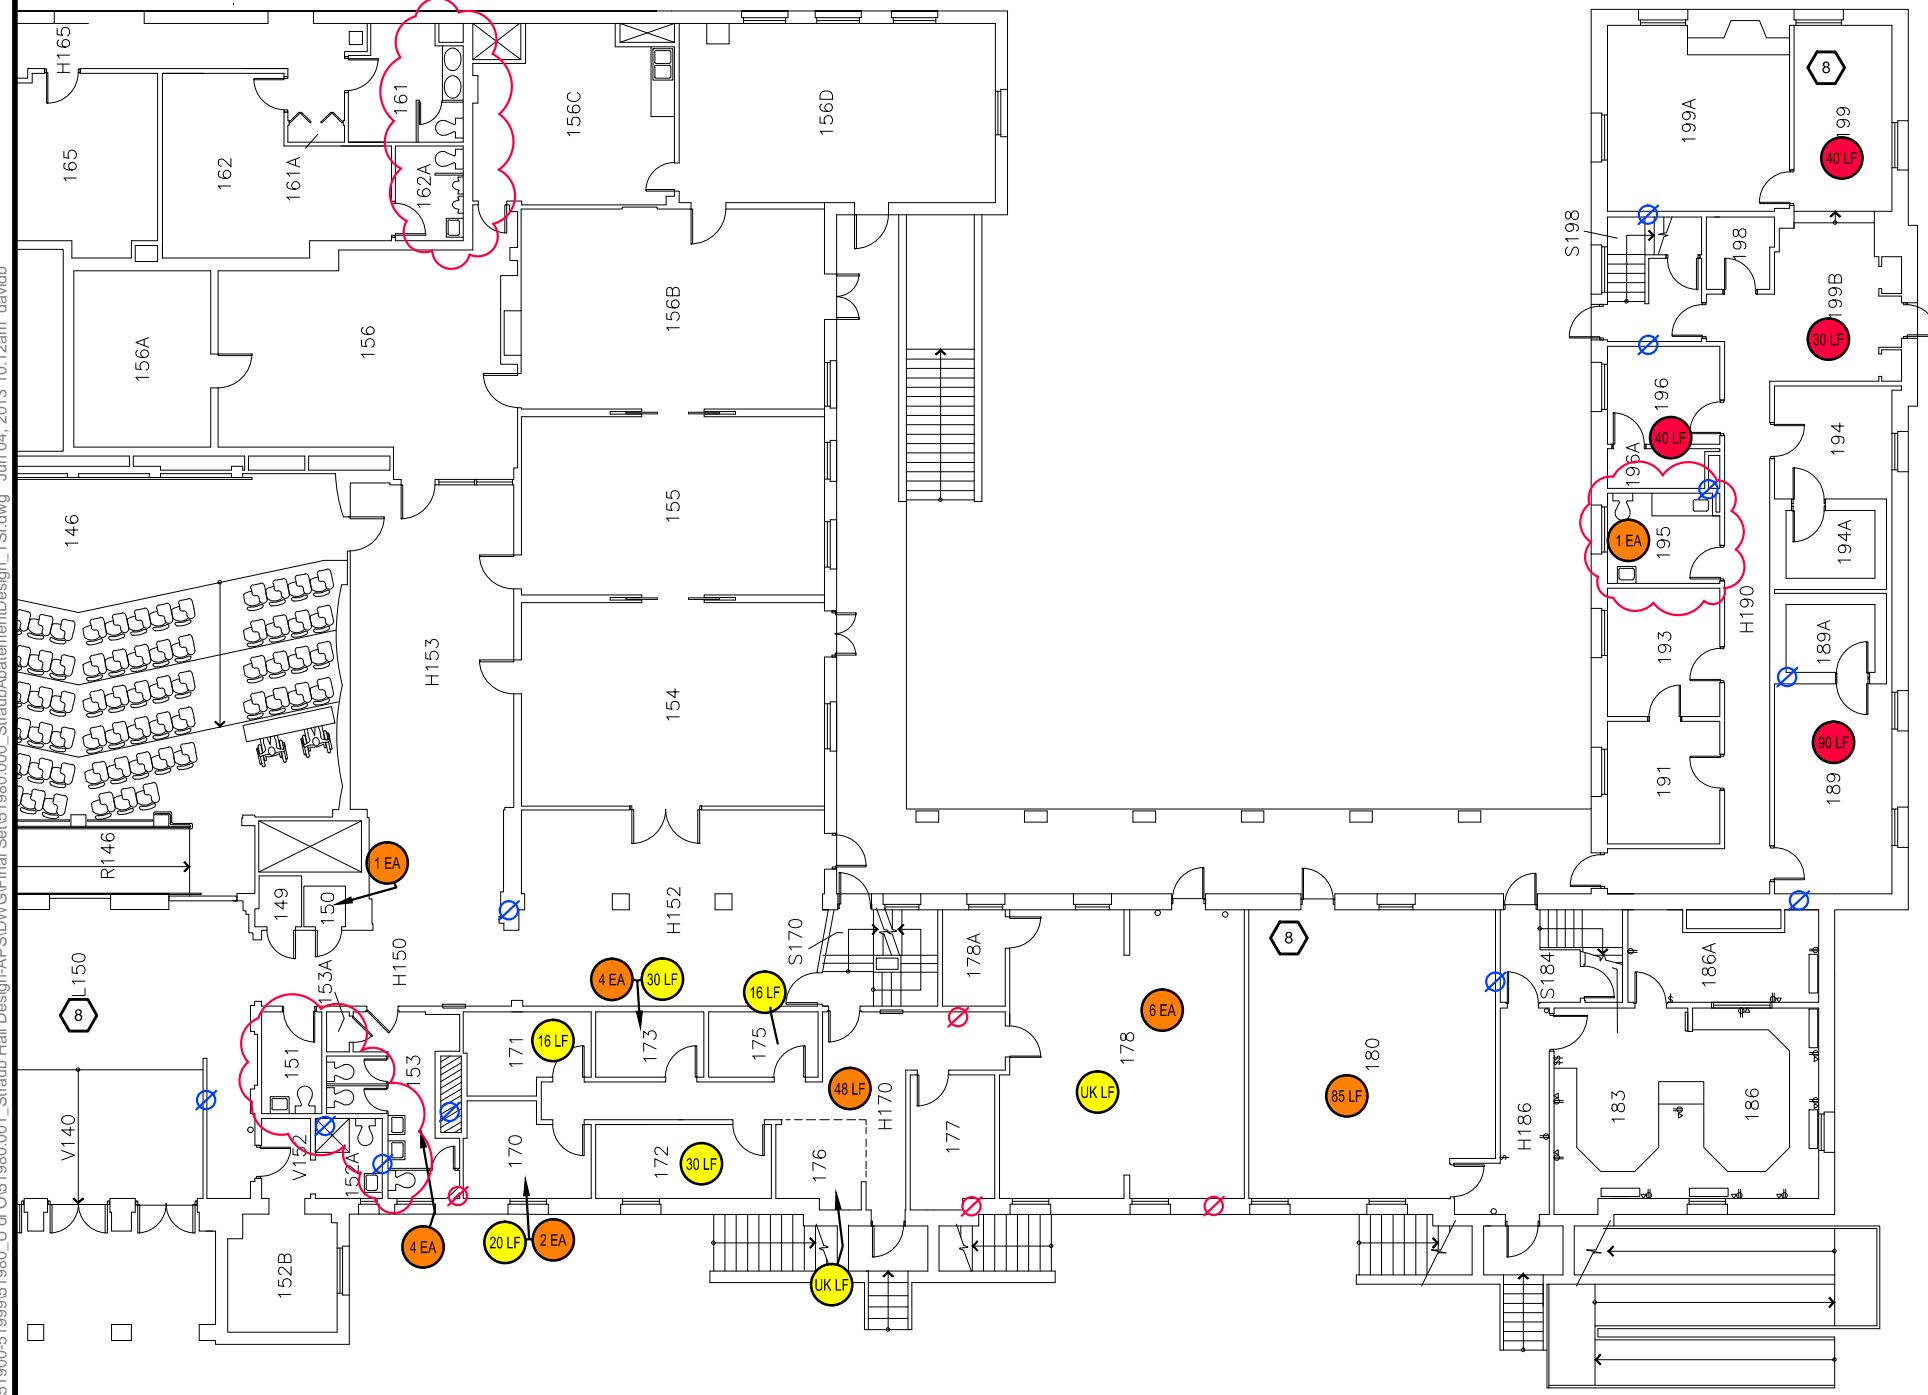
STRAUB HALL - FIRST FLOOR - SOUTH HALF
